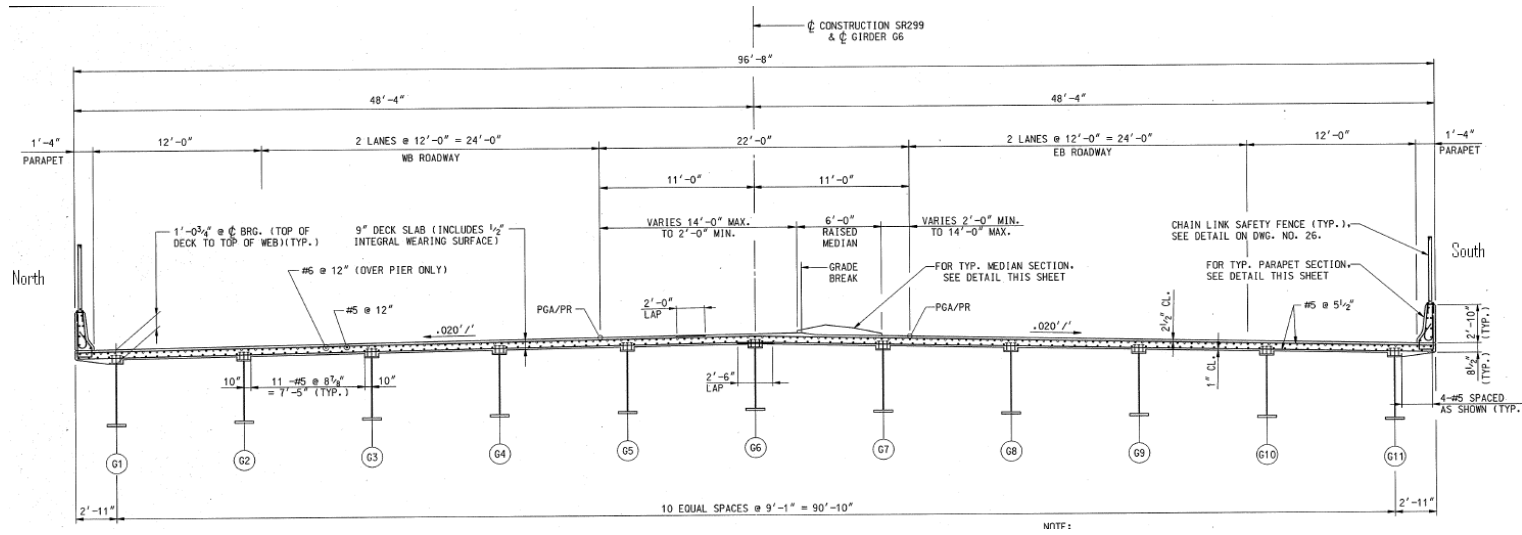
SR 299 Over SR 1 Bridge Cross-section
